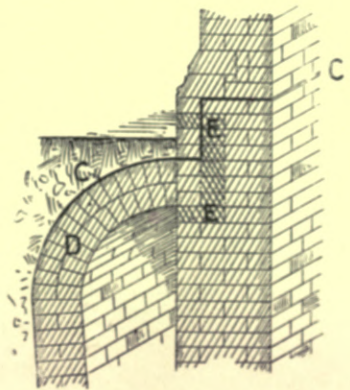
Dry Area formed with Brick Wall and Arch.
